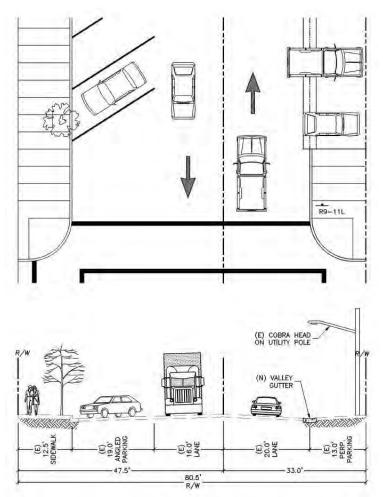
Potential 3rd Street Valley Pedestrian Improvement
